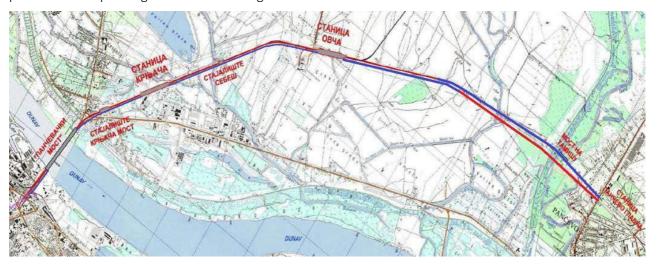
Situational view of the section Pancevacki bridge - Pancevo main (red color - existing track, blue color - upgraded track)
